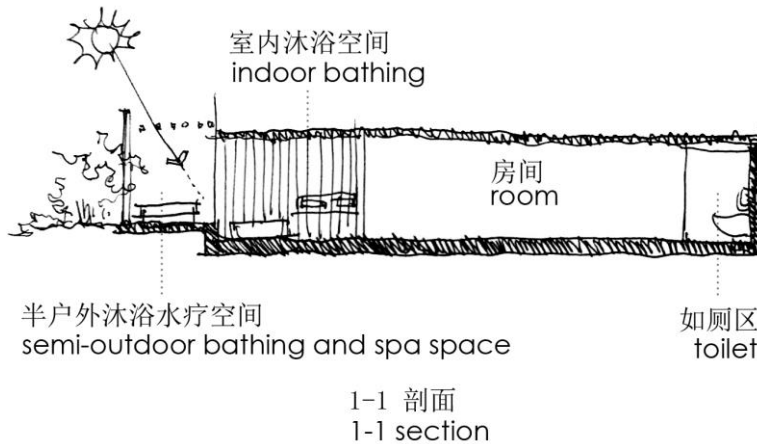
Section layout of guest room in Garden Terrace Miyazaki resort and hotel
